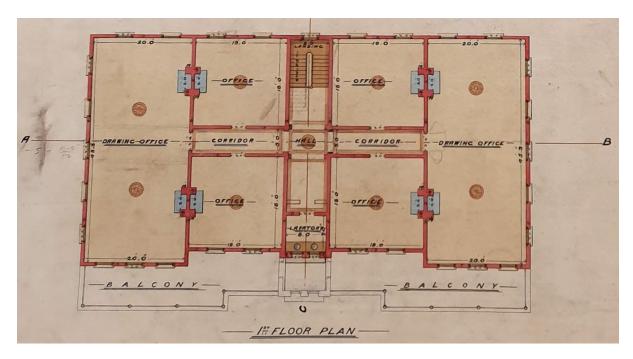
First floor plan of the original 1887 construction of the CME Building. Source: Rappaport & Caldis Cook Group, 1997
